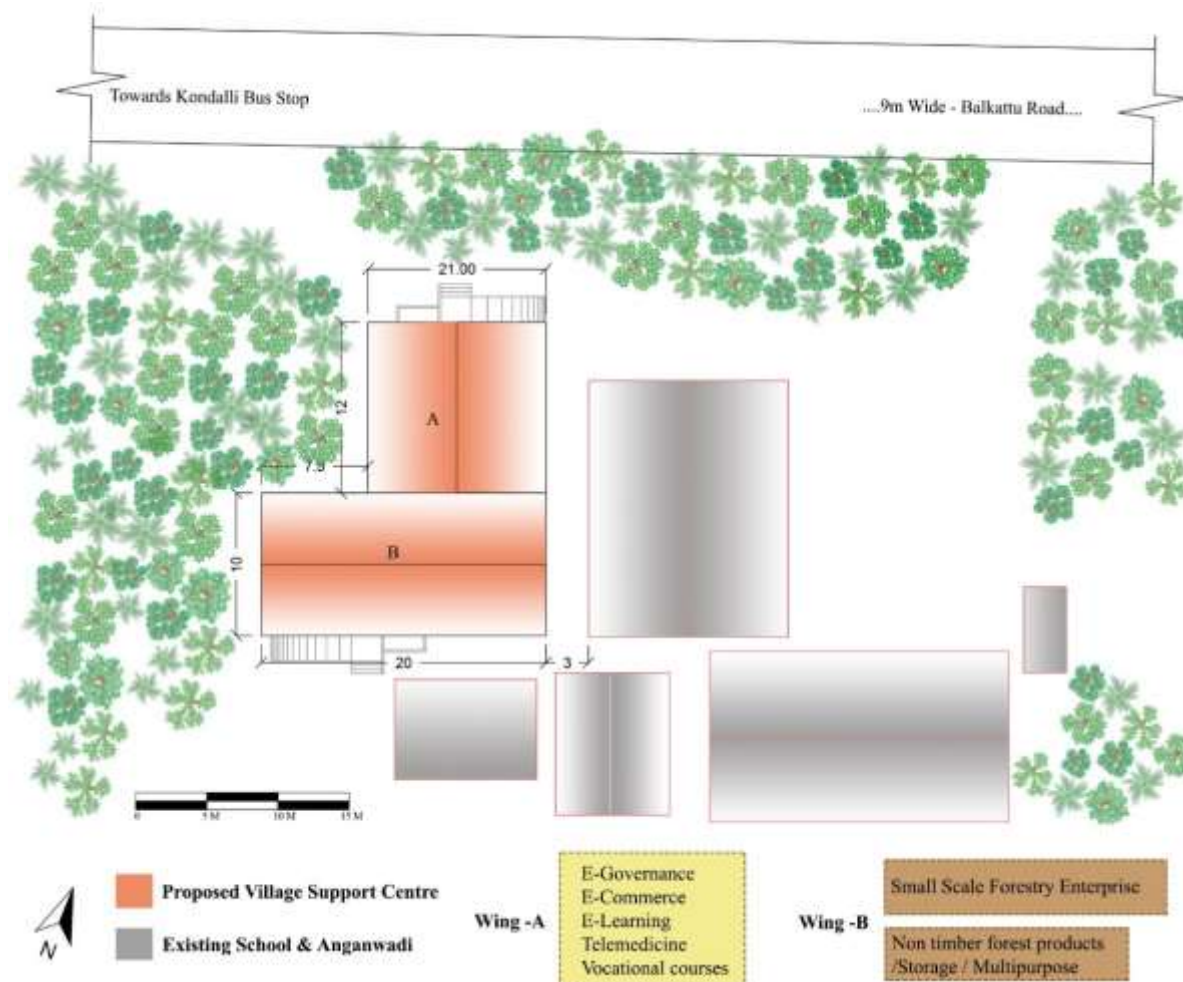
Site Plan of Proposed Village Support Centre. Source: Author
